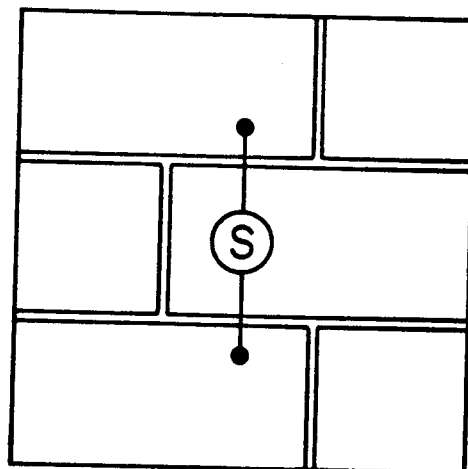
Elevation View of Loading Arrangement for Type II Specimens
